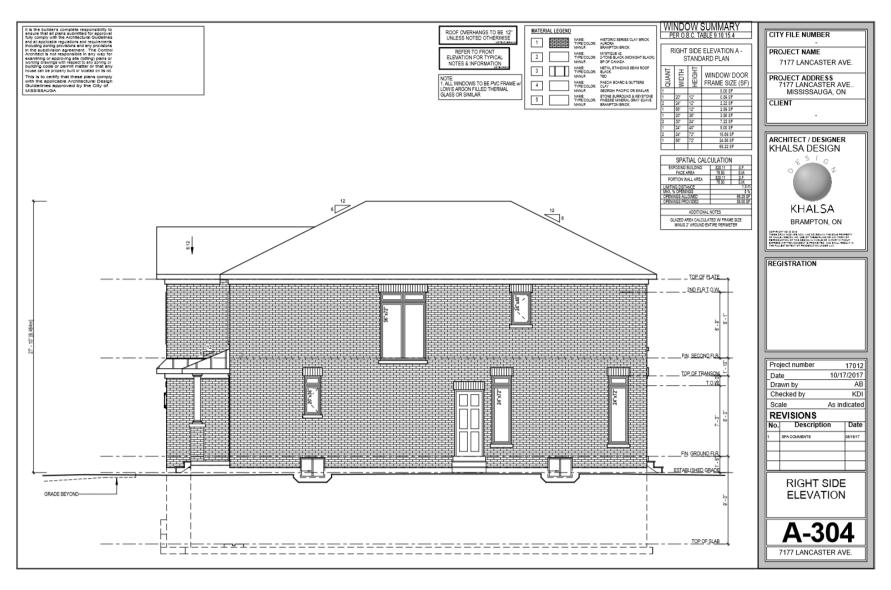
Right (south) Side Elevation A-304. (Image: Khalsa Design)
